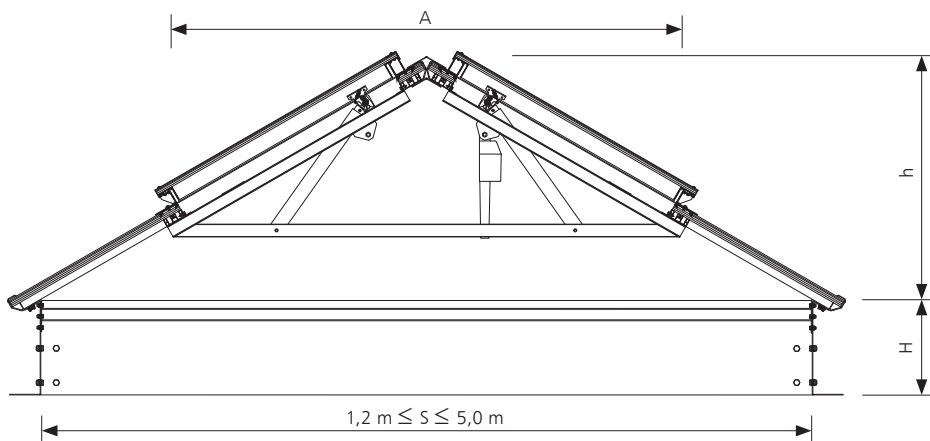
Cross section D-D of mcr PROLIGHT triangular shaped continuous rooflight with daily ventilation double-leaf vent
